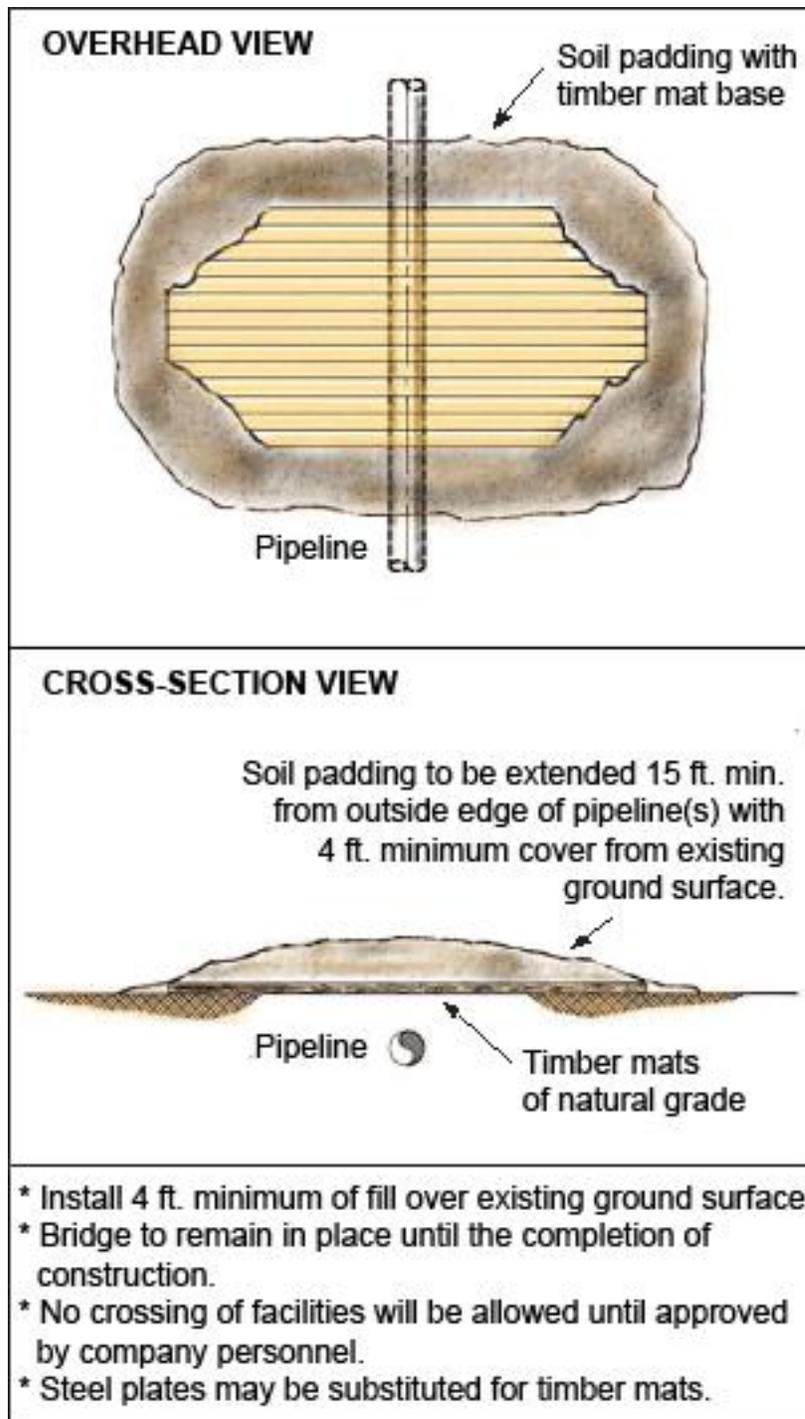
REQUIREMENTS FOR HEAVY EQUIPMENT CROSSING A PIPELINE.
